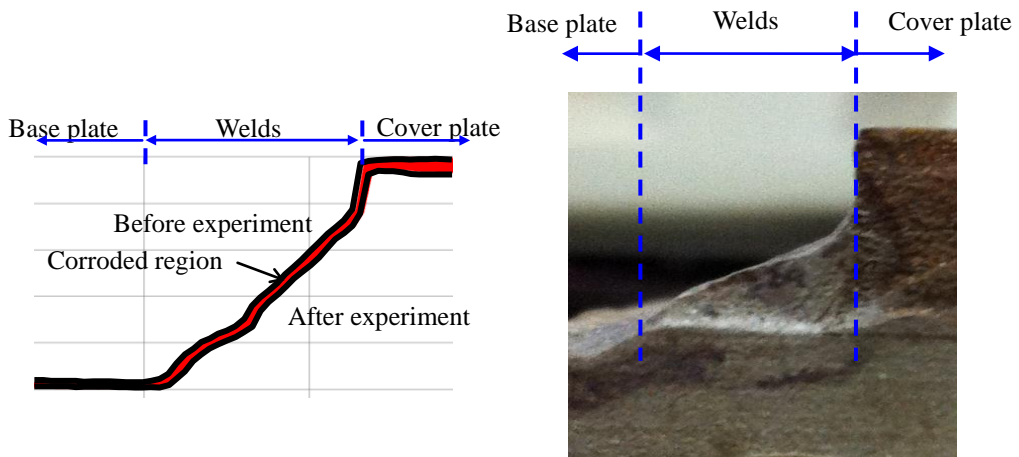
Change of surface profile of welded parts due to corrosion (TYA3)
